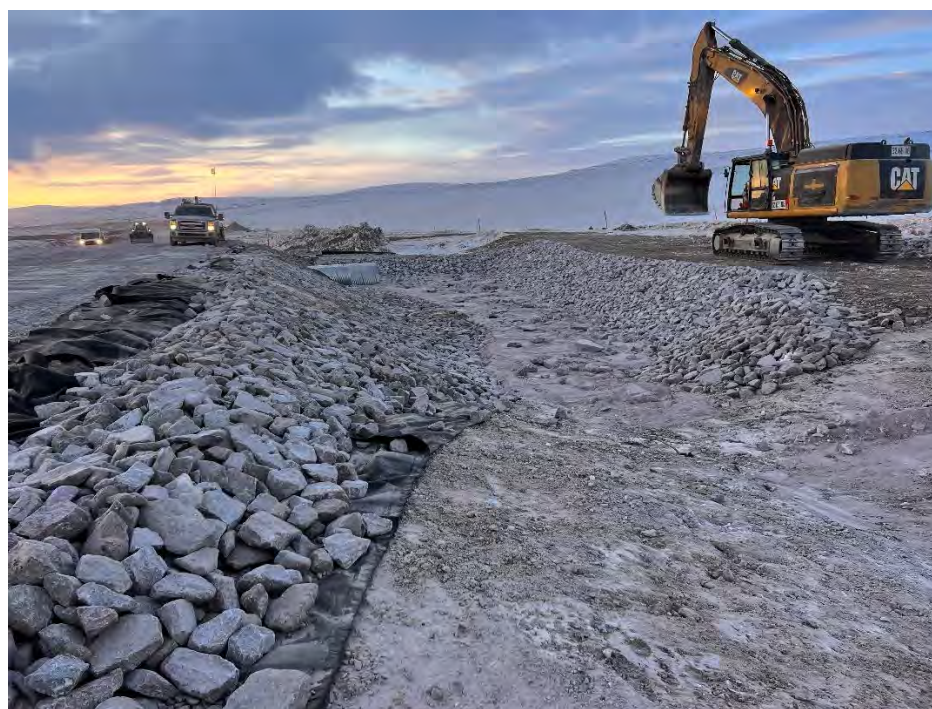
Inlet apron area infilled with Coarse Riprap and 3/16 inch material at CV-106. Photo taken May 11, 2024, facing north.
